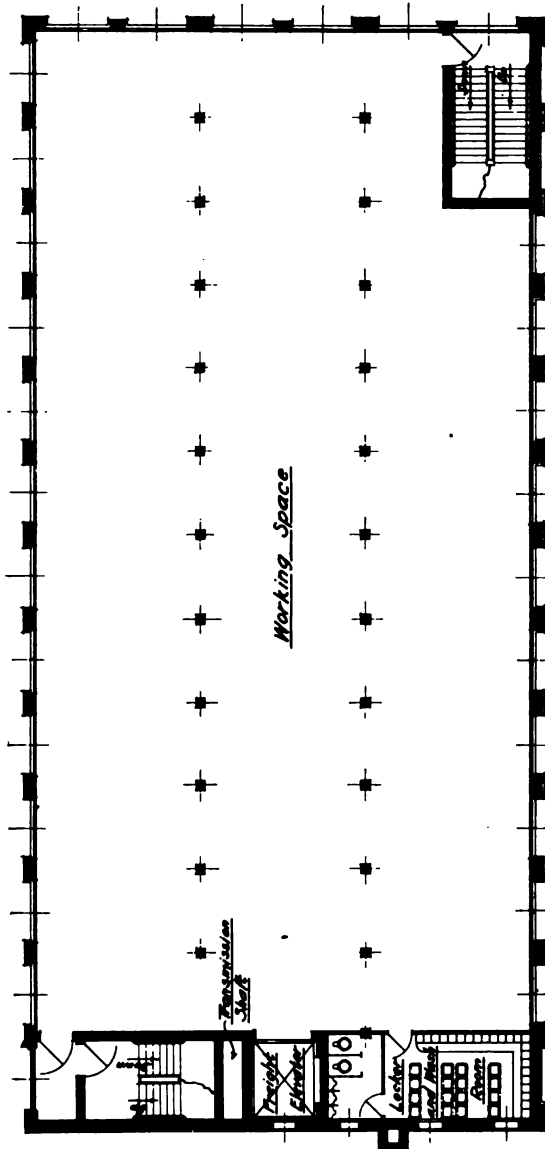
FACTORY BUILDING MILL CONSTRUCTION. TYPICAL FLOOR PLAN
